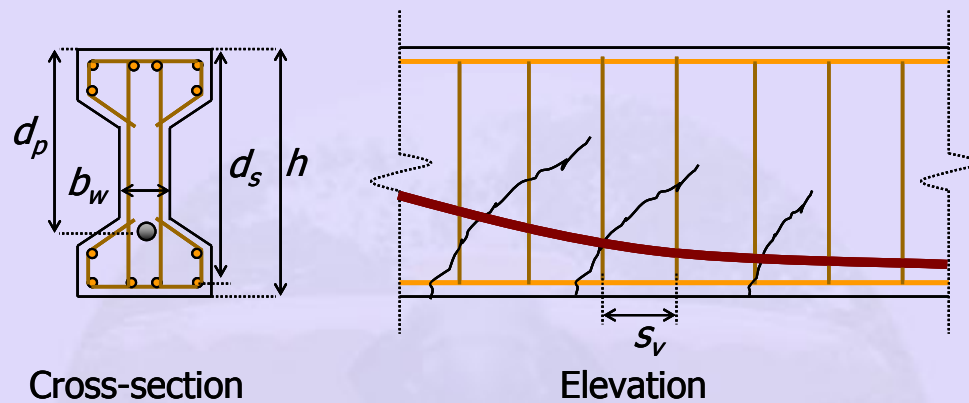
Cross-section and elevation of a beam showing stirrups
